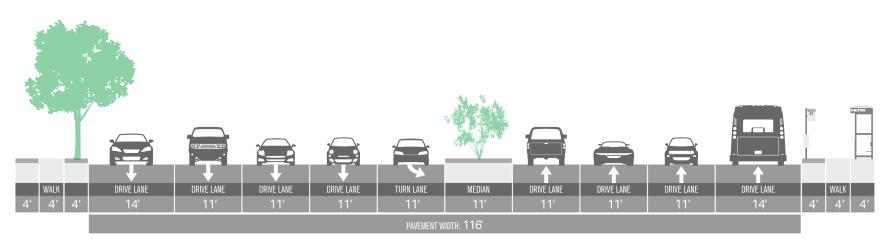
EXISTING CROSS SECTION OF HILLCROFT AVENUE AT DASHWOOD DRIVE
